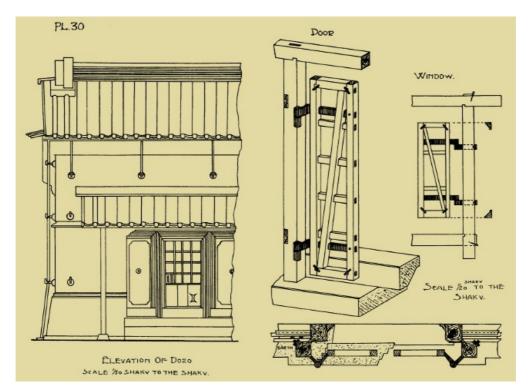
ELEVATION OF DOZO, DOOR, WINDOW
